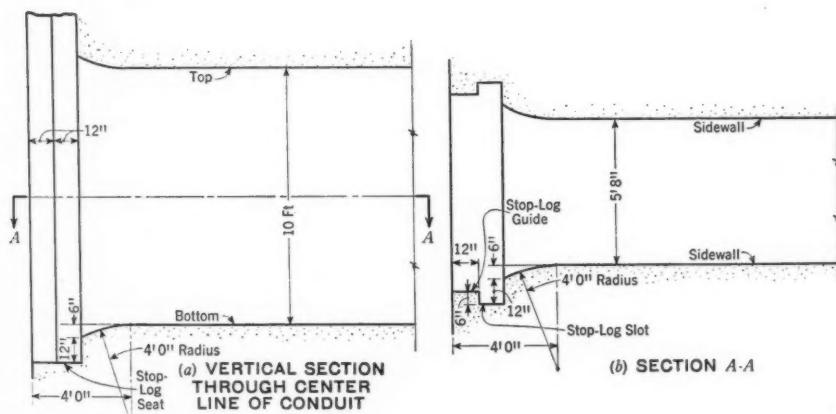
ORIGINAL CONDUIT ENTRANCE, MADDEN DAM
